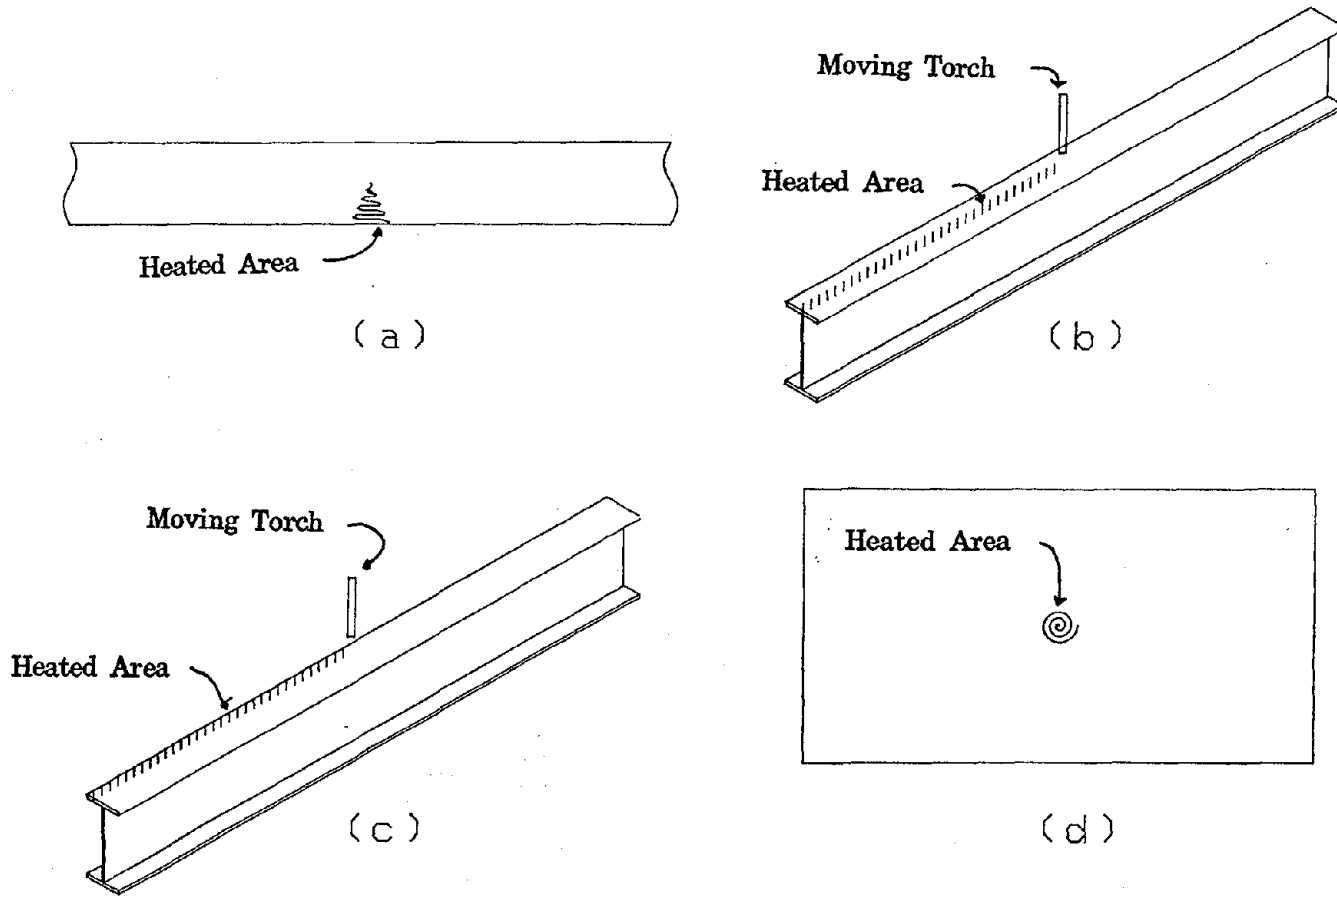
Typical Heat Patterns Used In Fabrication and Damage Repair
